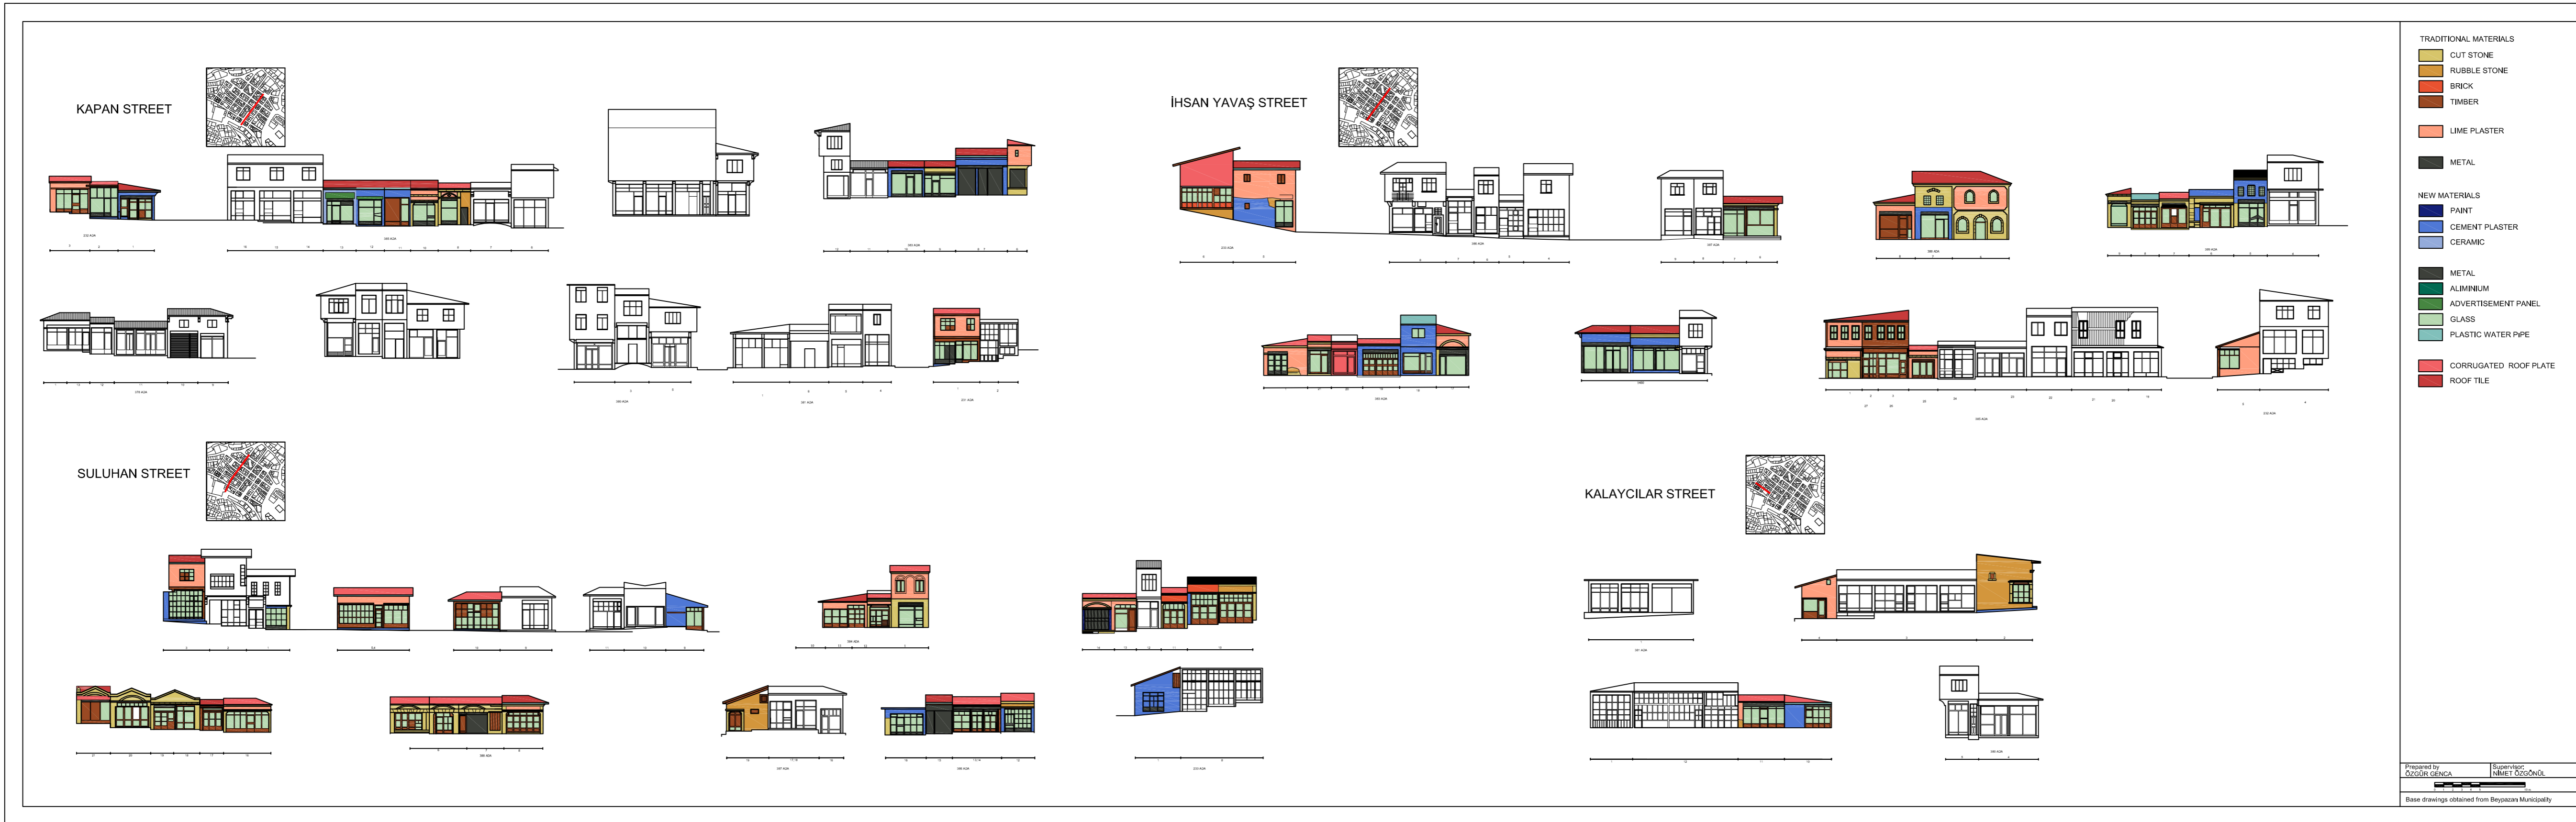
Street facades-Kapan, İhsan Y., Suluhan and Kalaycılar Streets
